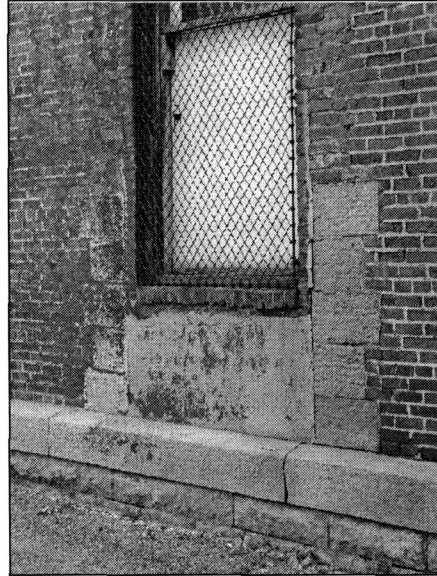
Stone quoins framing a former door base, north alley sidewall, view southeast
